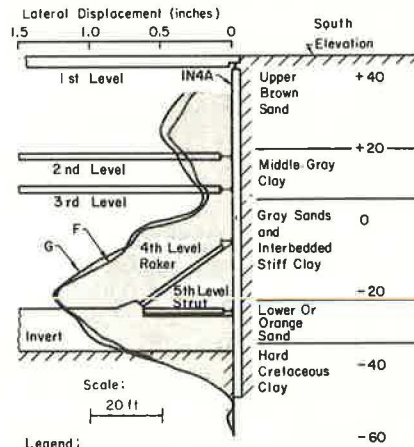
Displacements at south wall when excavation and bracing completed.
